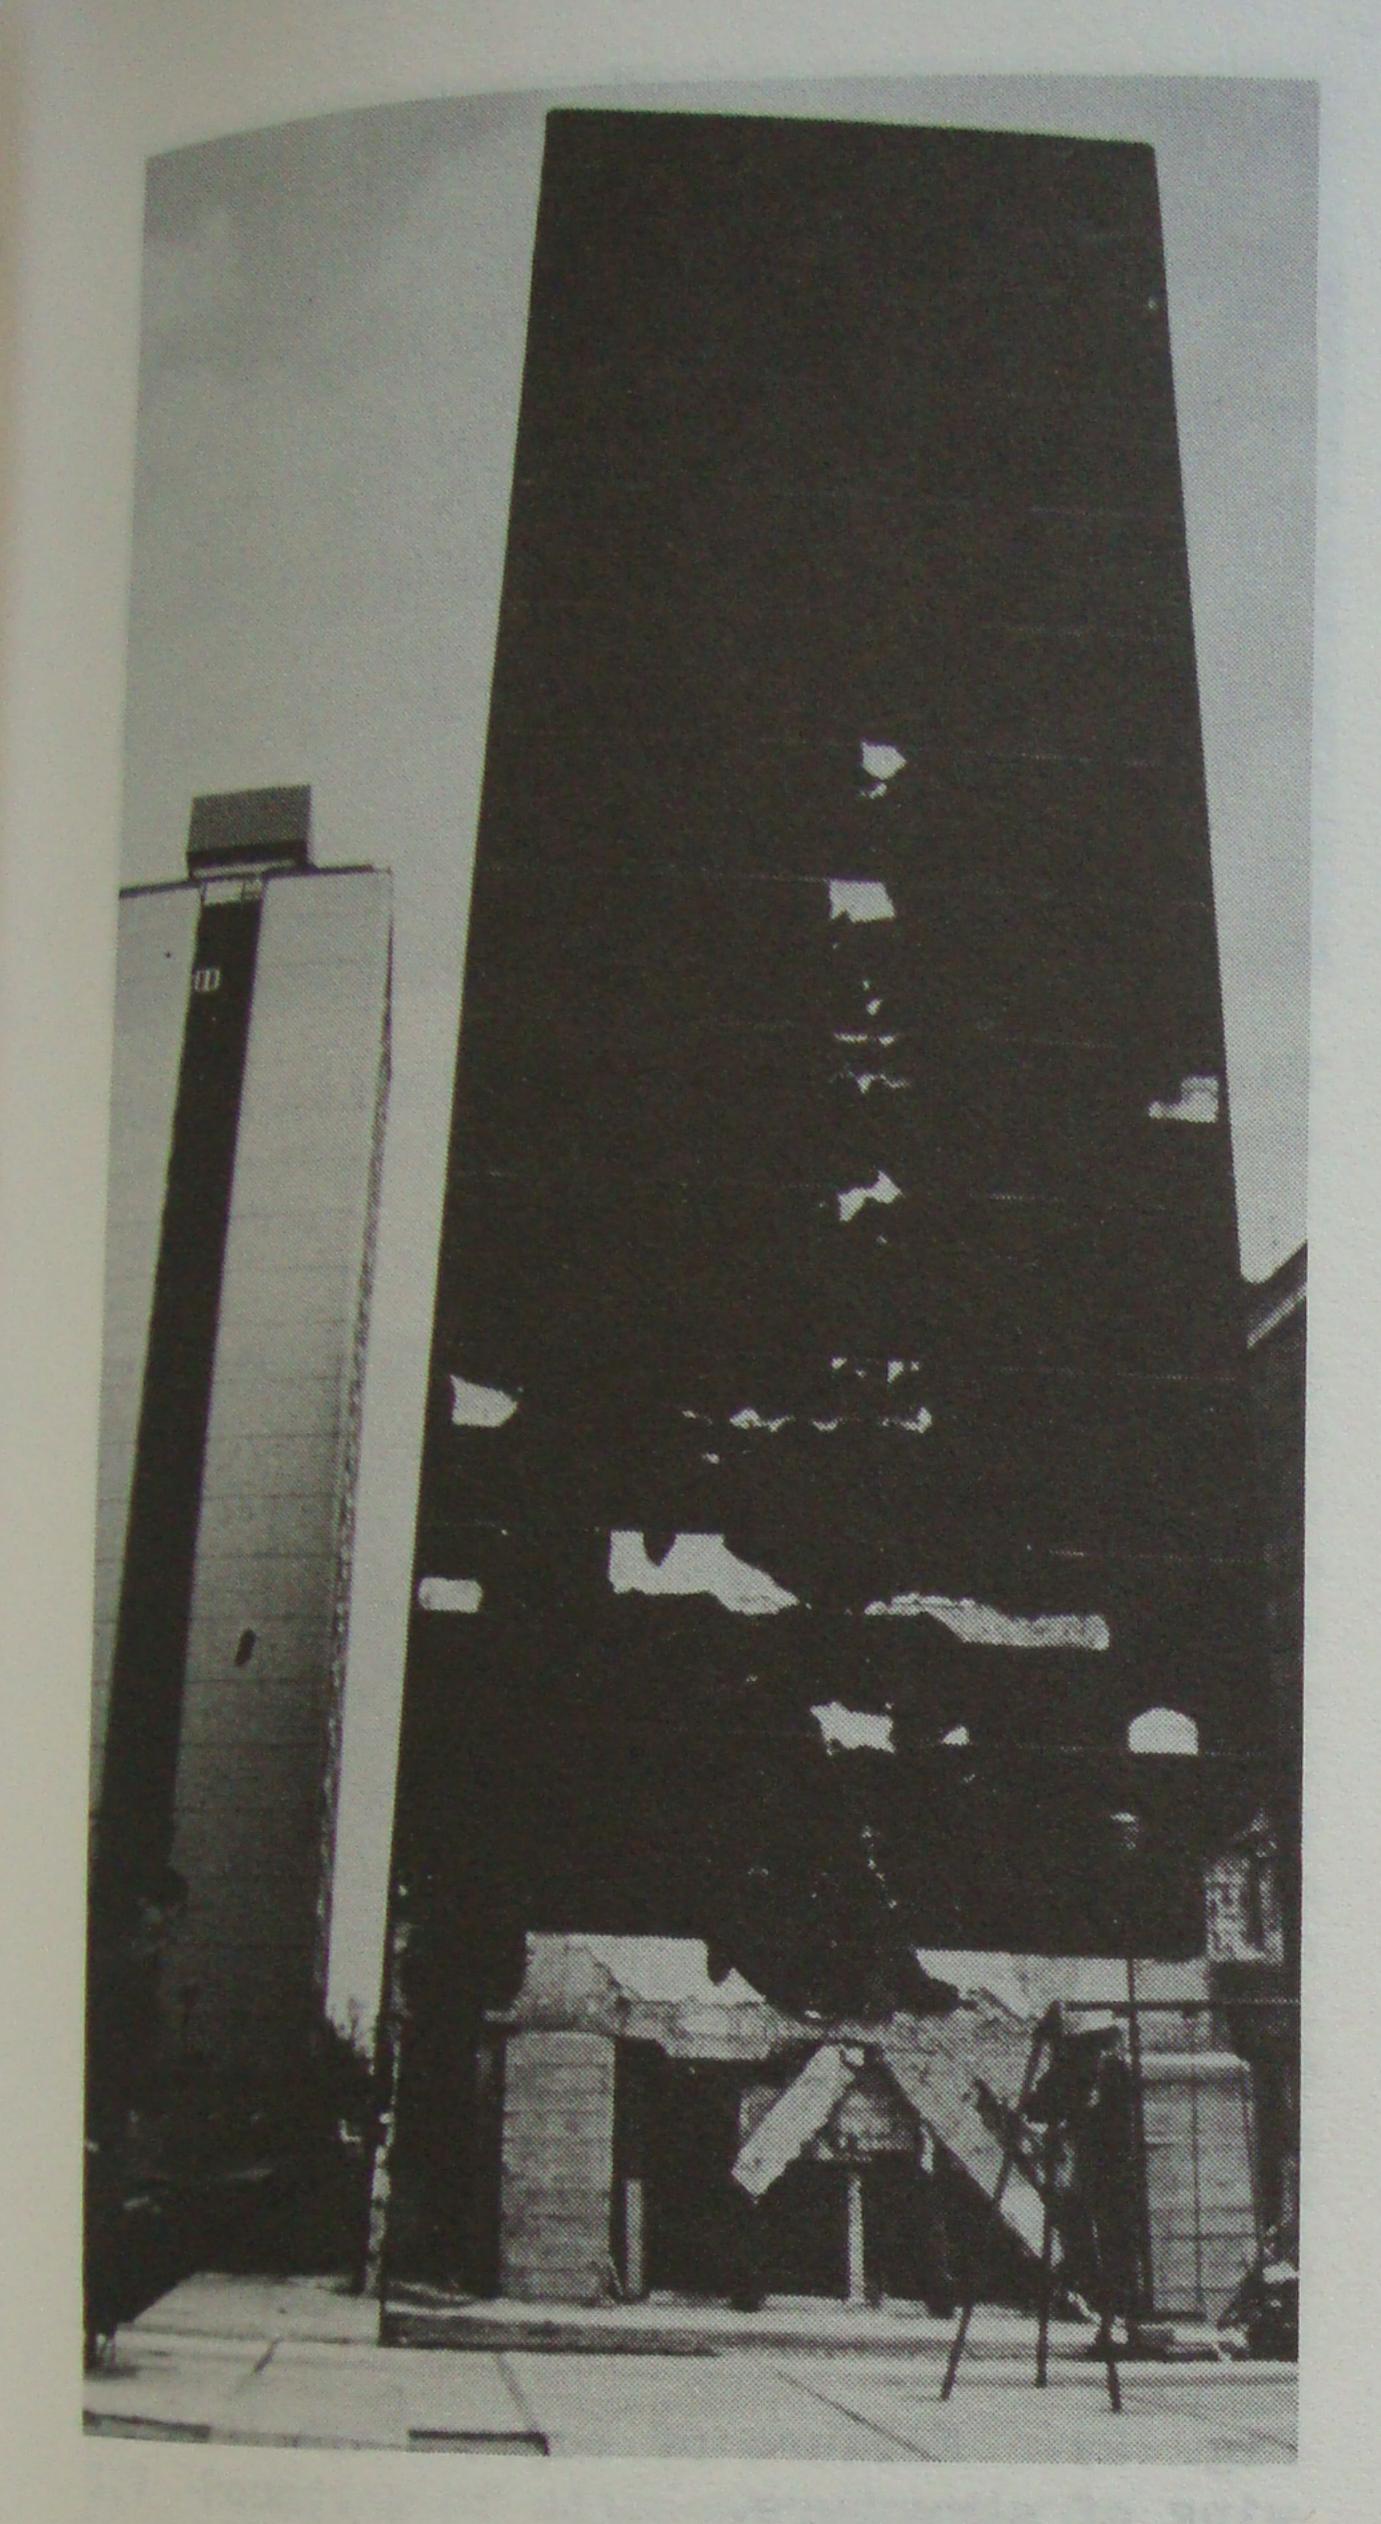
Failure of reinforced concrete bracing and infilled masonry wall of 13 storey apartment structure.
